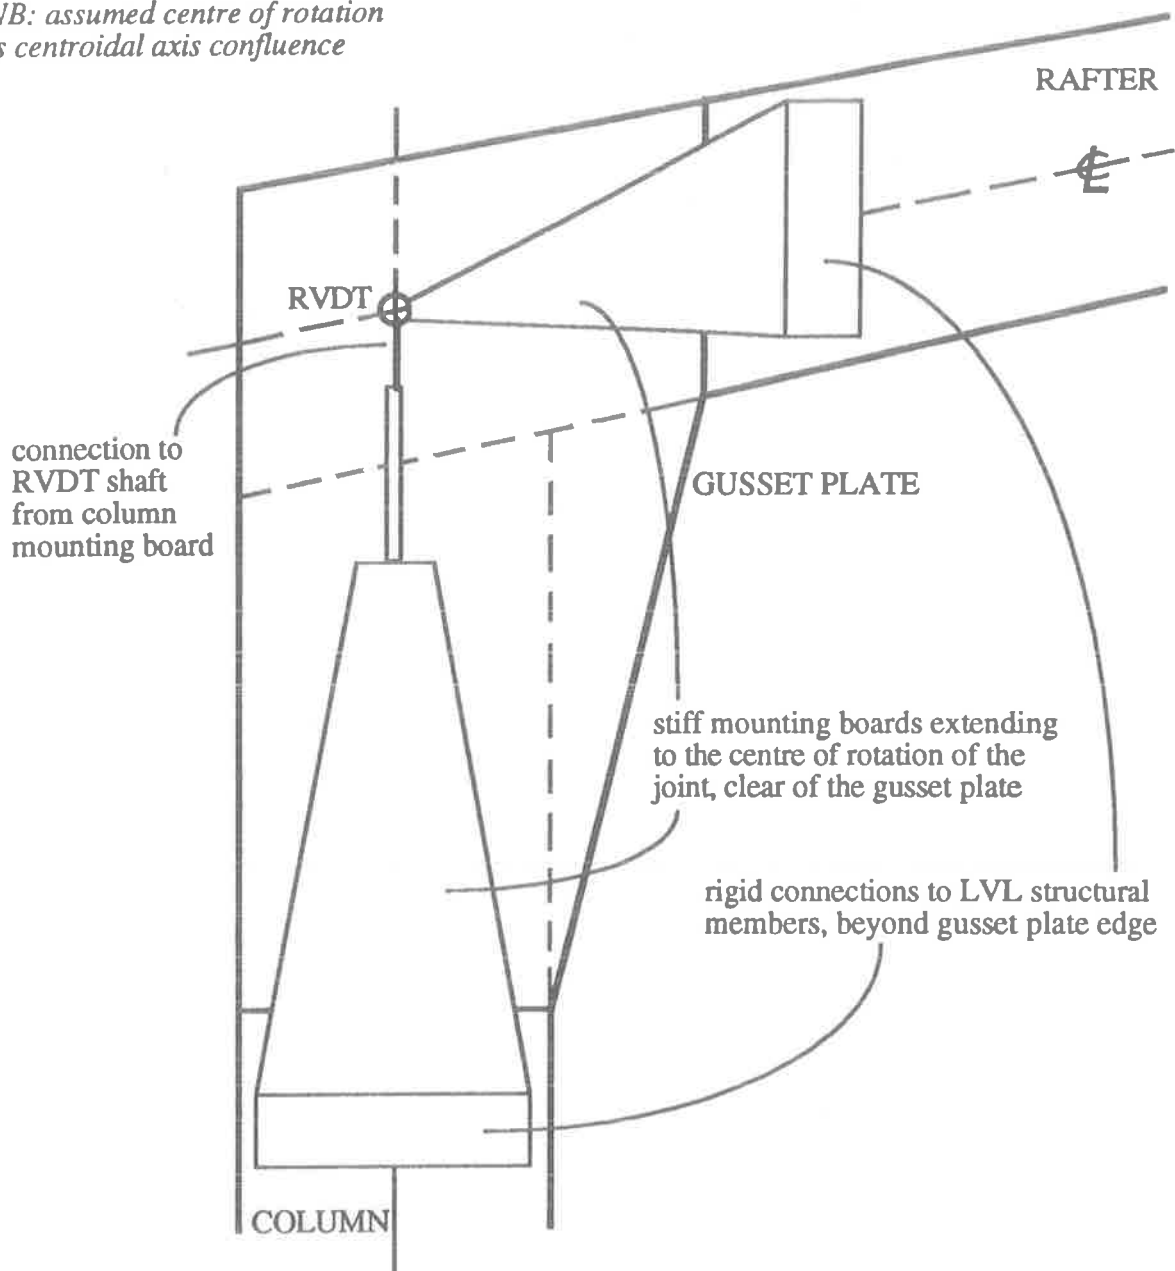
Elevation of the 'knee' joint showing the RVDT mounting arrangement
